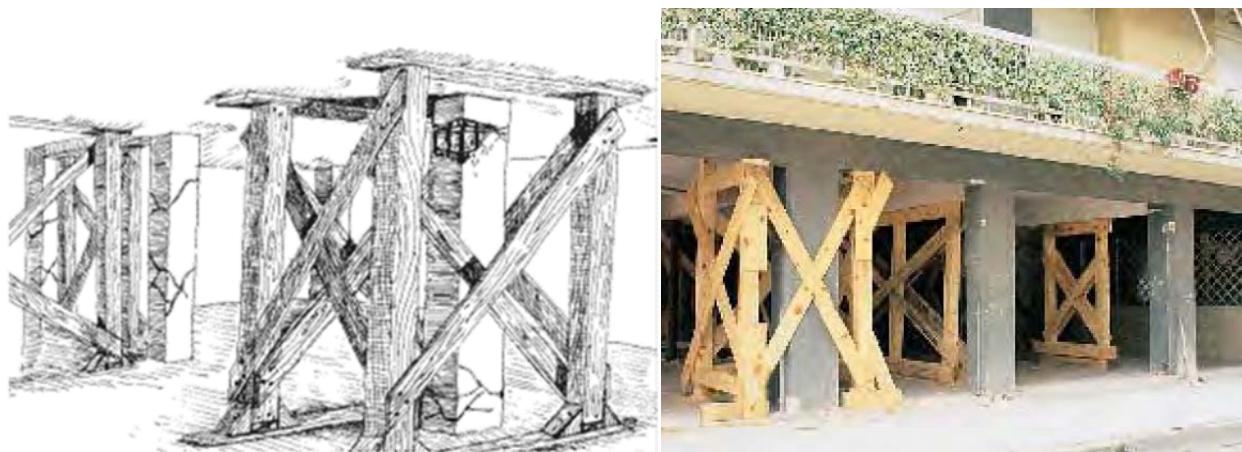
Propping with wooden beams around a damaged column (EPPO, 2000)
